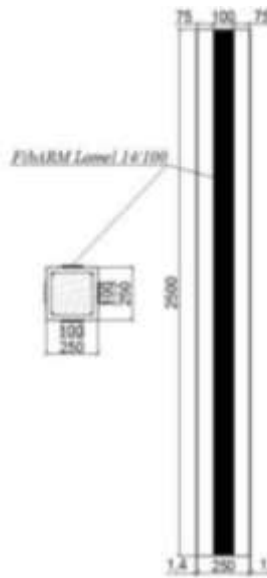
Reinforcement of a column of group B only with lamellas (source [5])
